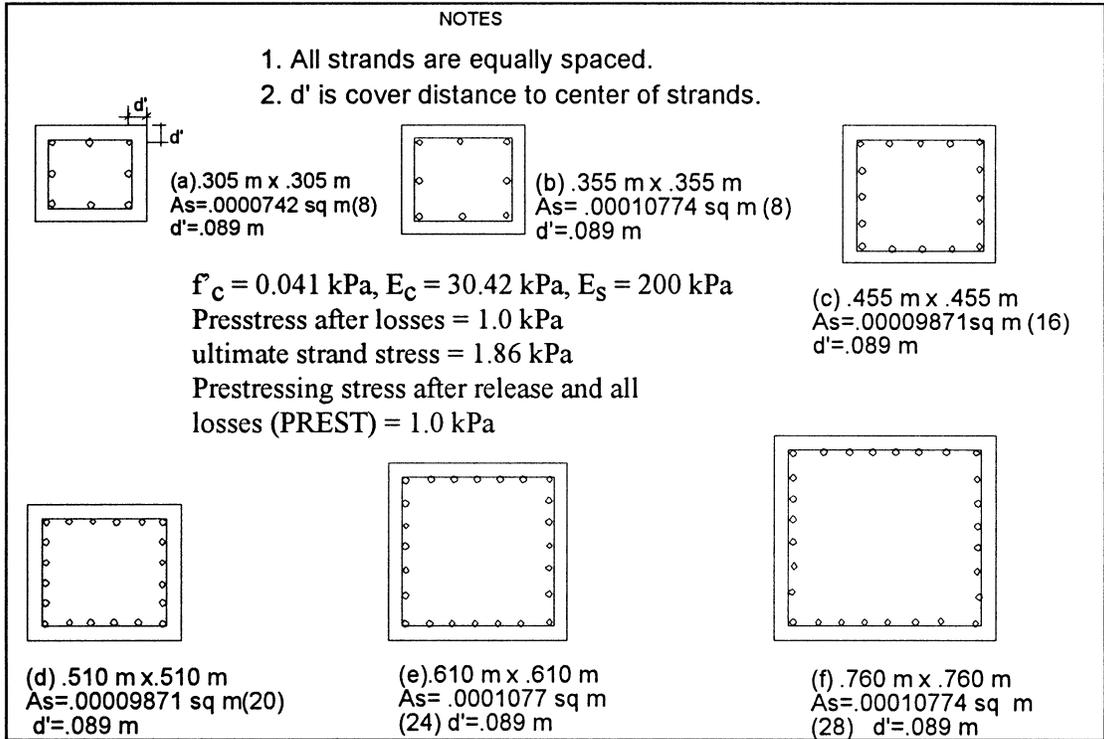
Standard FDOT Prestressed Concrete Pile Sections (meters, kN)
